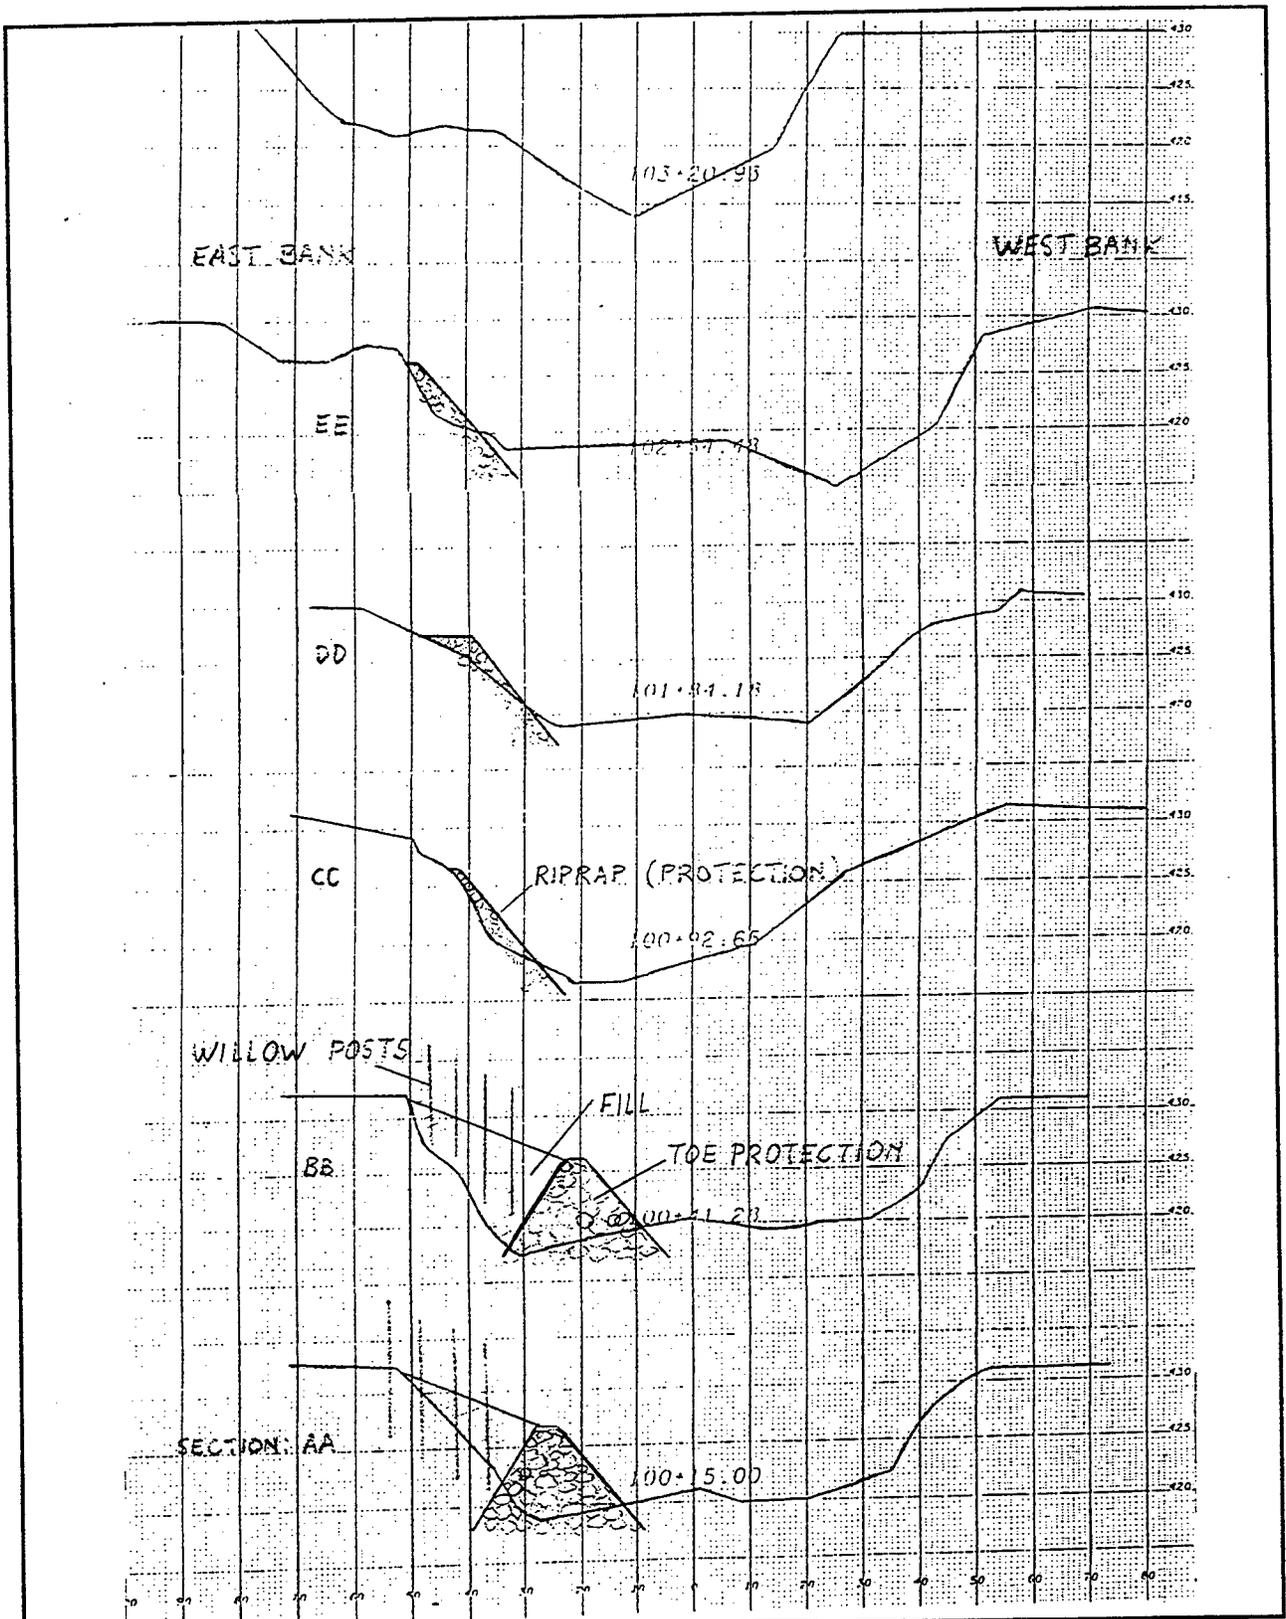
Piasa Creek site alternative 1 design schematic (cross-section view).
